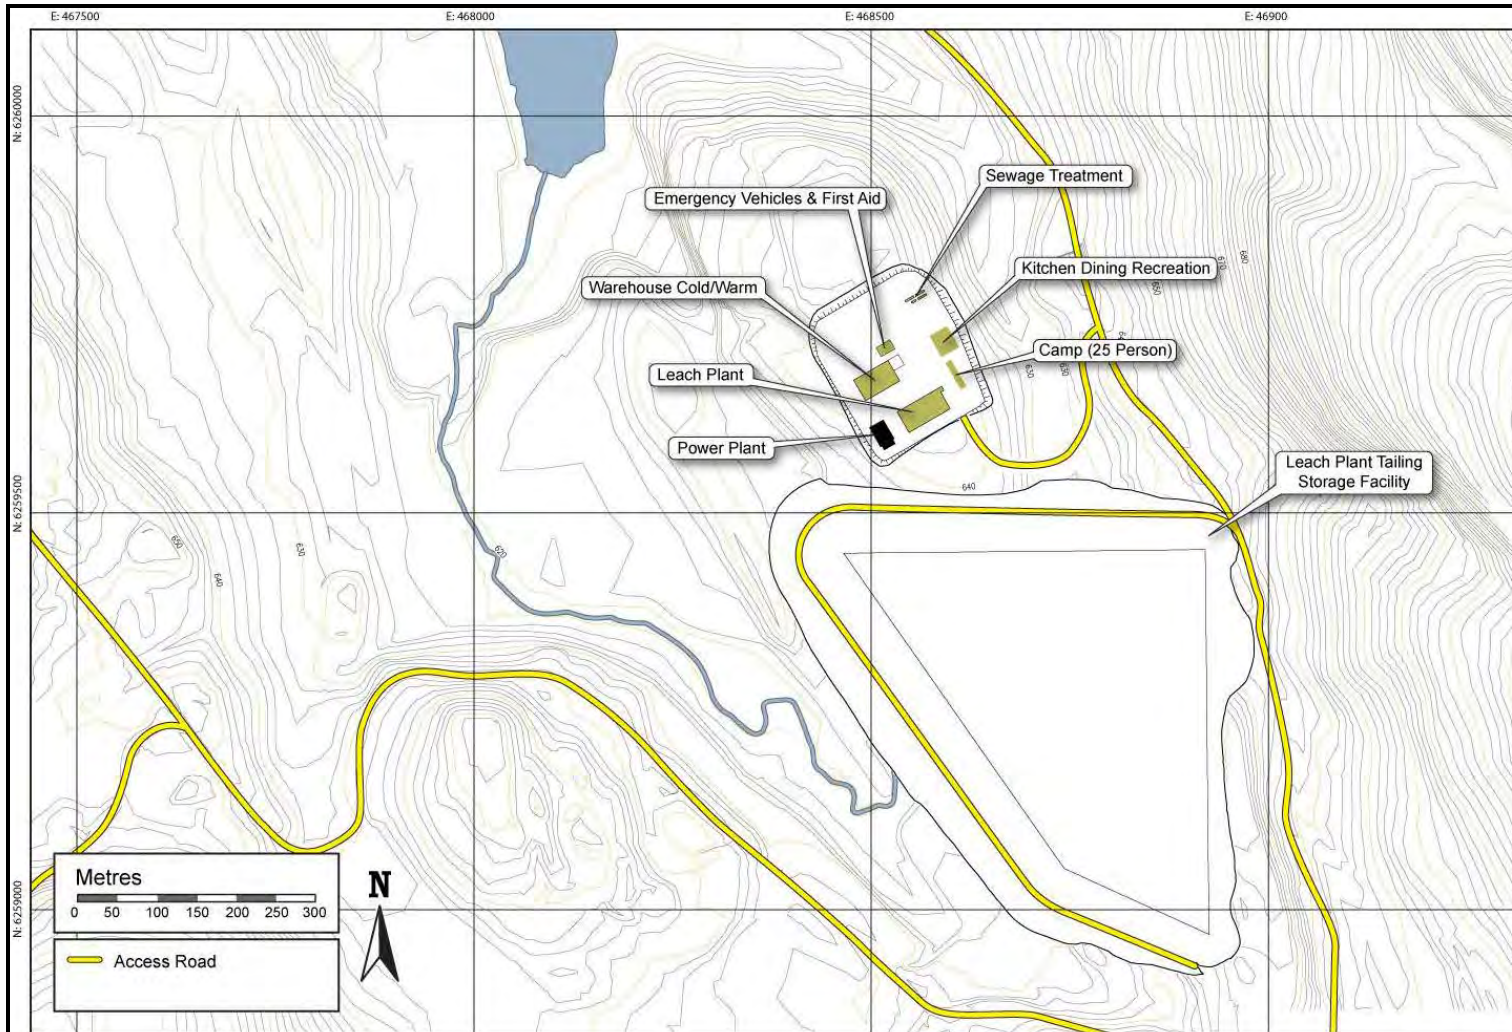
Brucejack Overall Site Plan – Leach Plant
